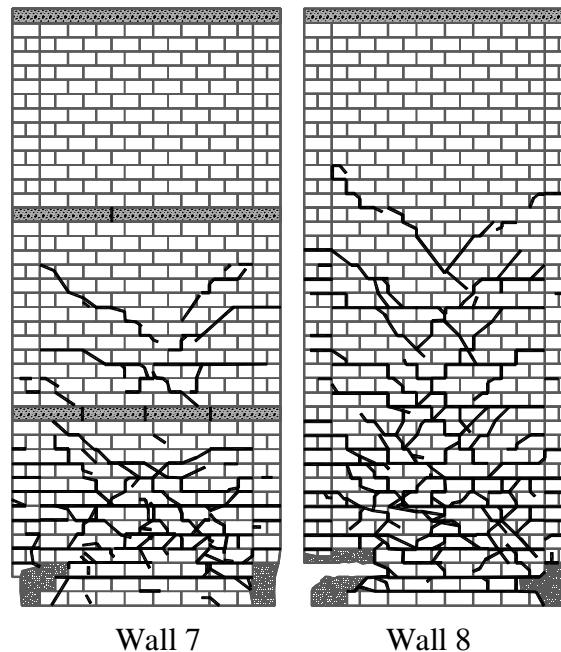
Crack Patterns of Wall 7 and Wall 8 Illustrating the Influence of Inter-storey slabs on Crack Patterns
